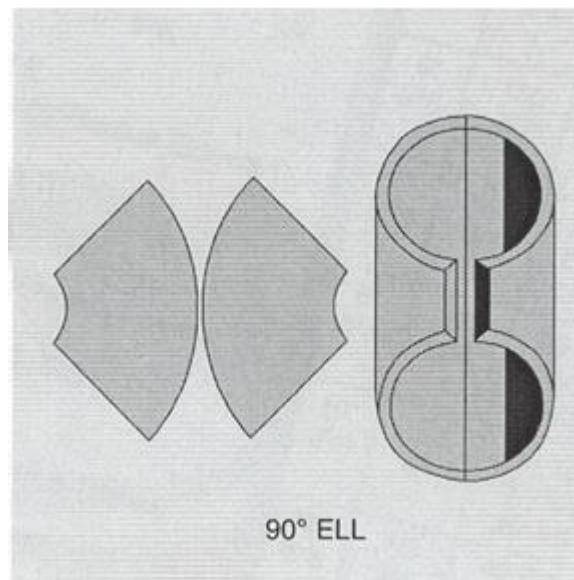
90-degree elbow installation with sheet form insulation on piping greater than 5-inch IPS.
